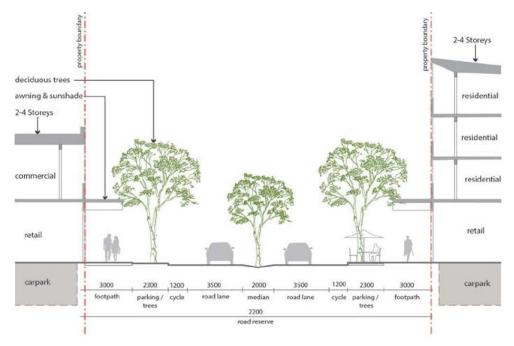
Figure 4-6 Indicative Cudgegong Local Centre Main Road Street Section (DCP)
